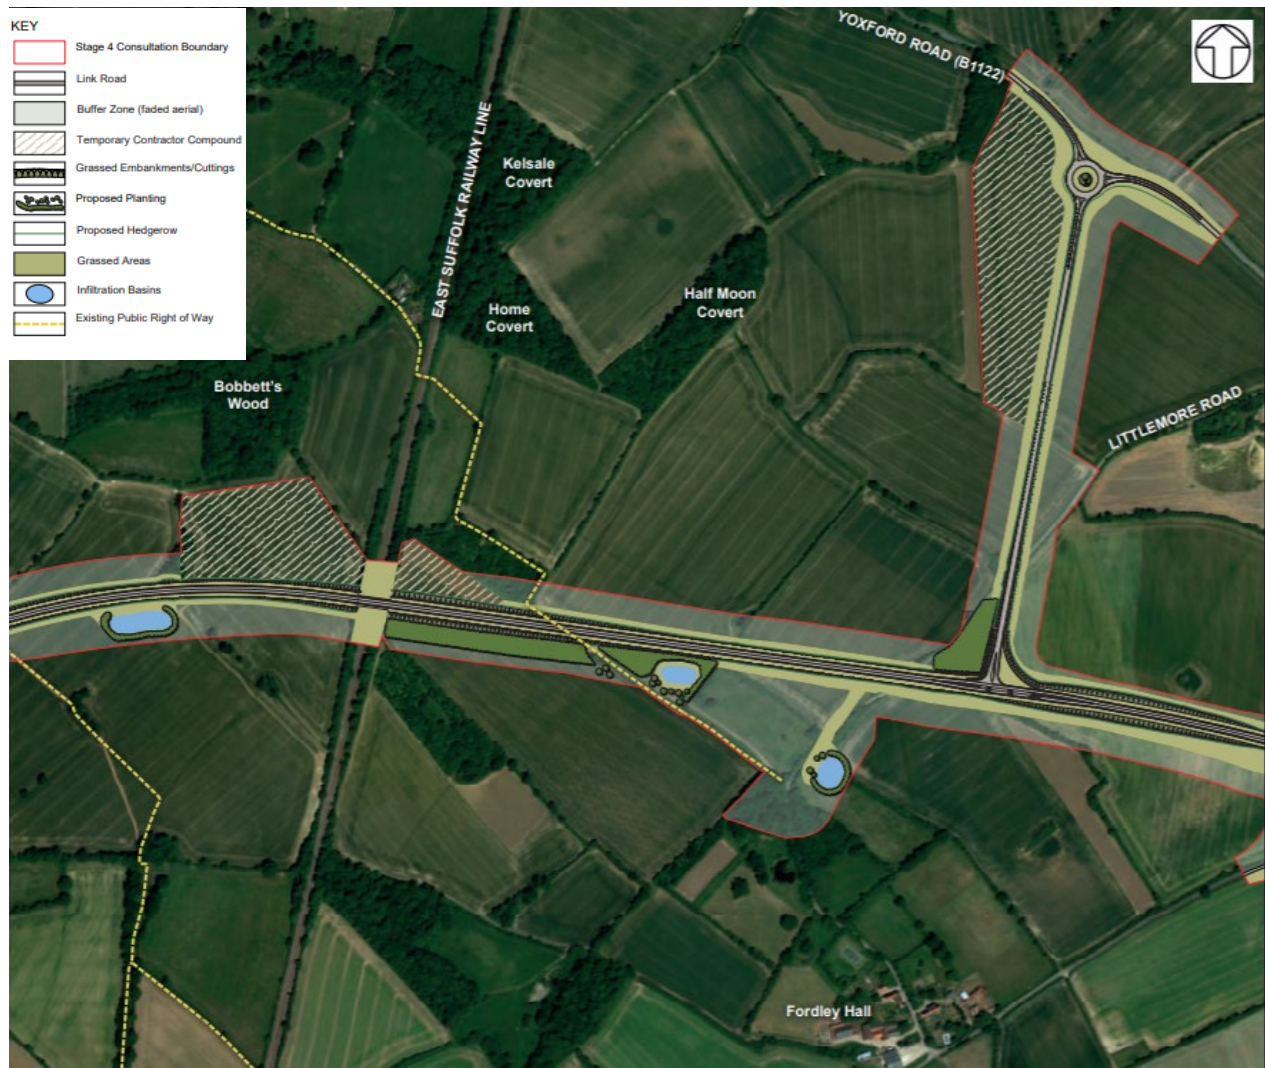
Stage 4: Indicative Sizewell link road masterplan Area 3
